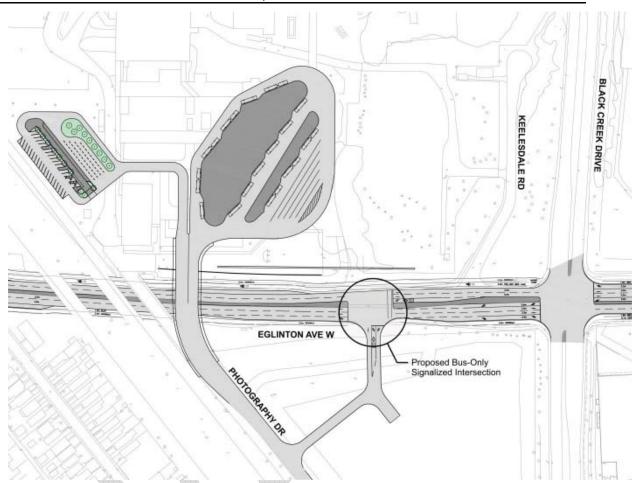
Proposed Signalized Intersection at No-Frills Site
